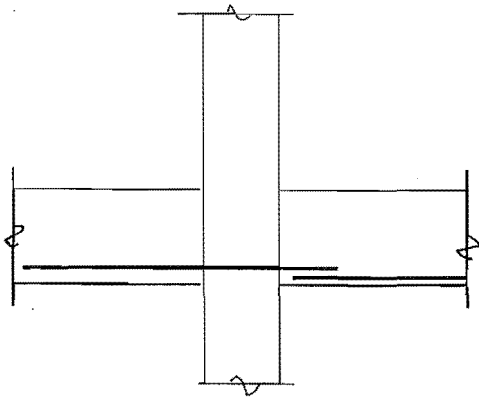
Lap splice of beam longitudinal bars in plastic hinge regions
